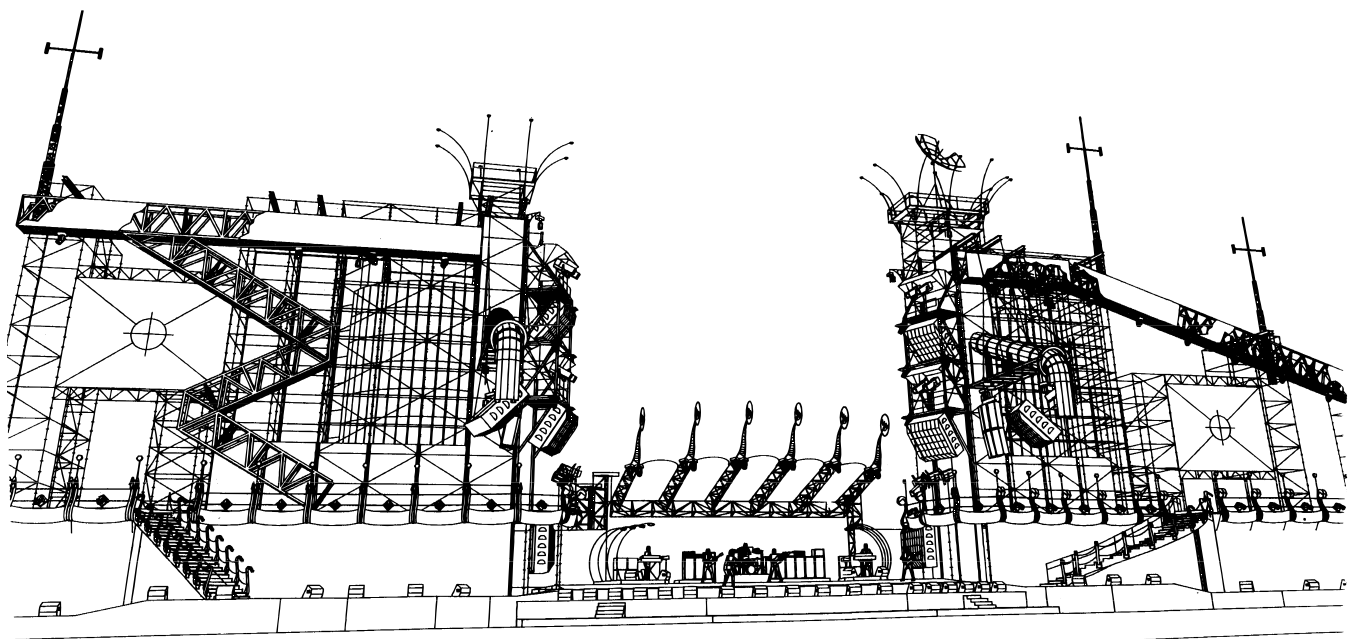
CAD drawing of the 'Steel Wheels' tour set.
